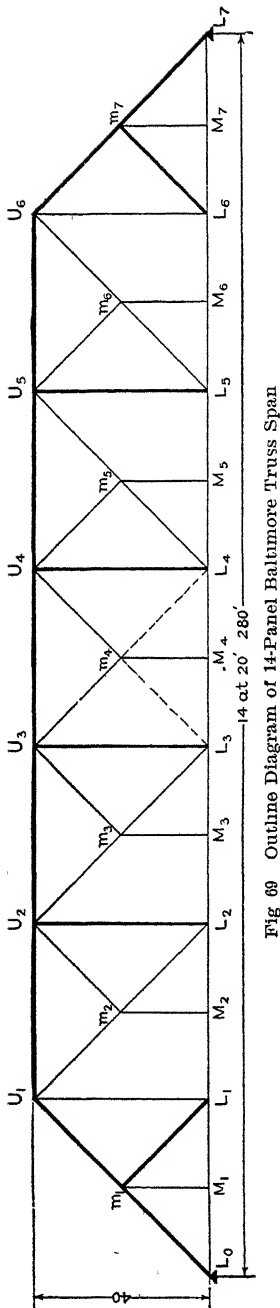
Outline Diagram of 14-Panel Baltimore Truss Span
